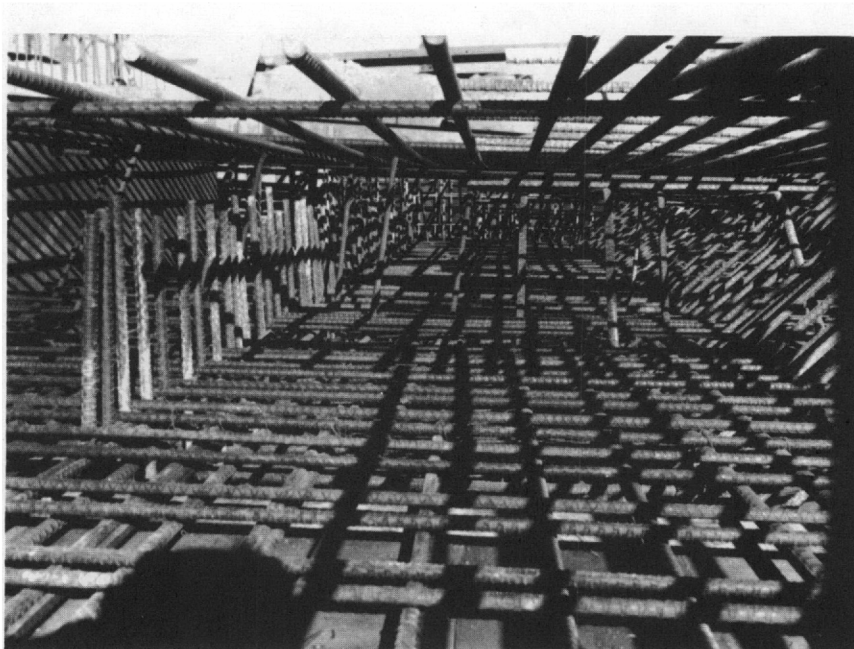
Bottom-mat reinforcement details over rolling door.
